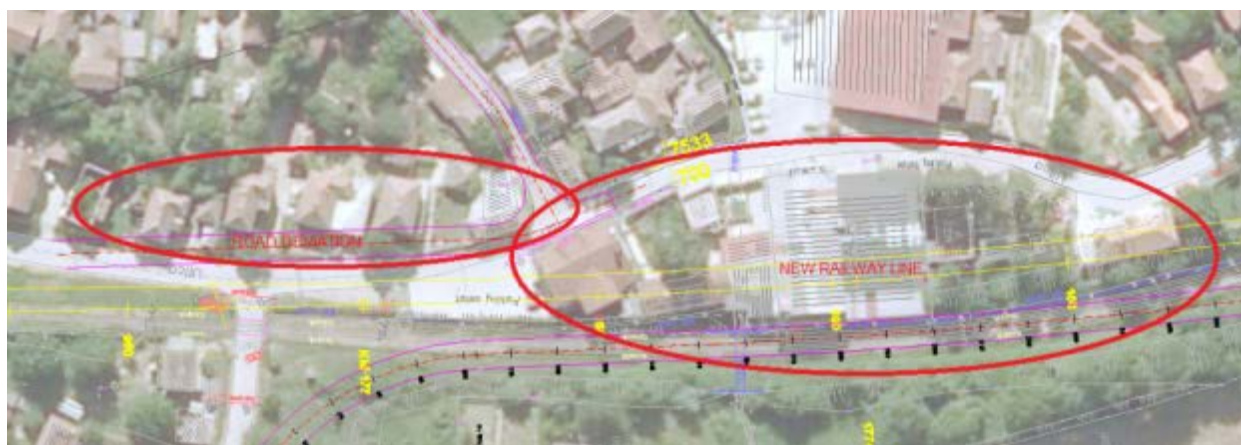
Residential and commercial buildings that are on the route of the new railway line
